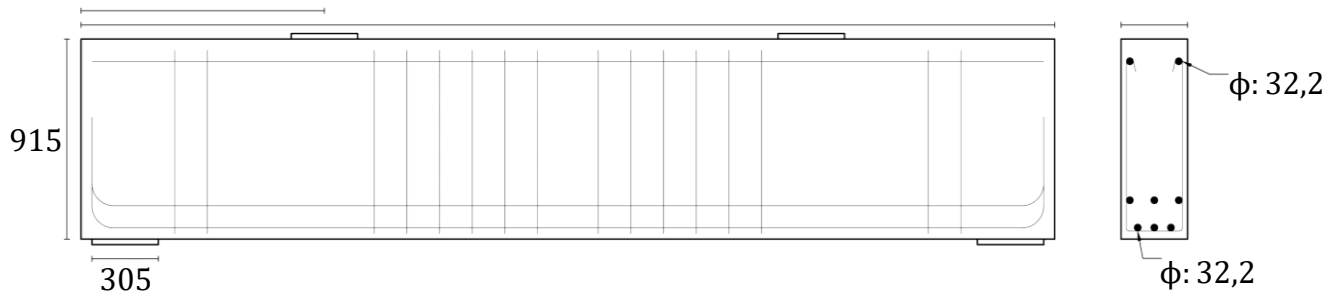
A sidewise view and section in critical shear span of beam STM-M. The vertical rebars are 9,5 mm in diameter. Adapted from (Abdelrahman, Tadros and Rizkalla, 2003).
